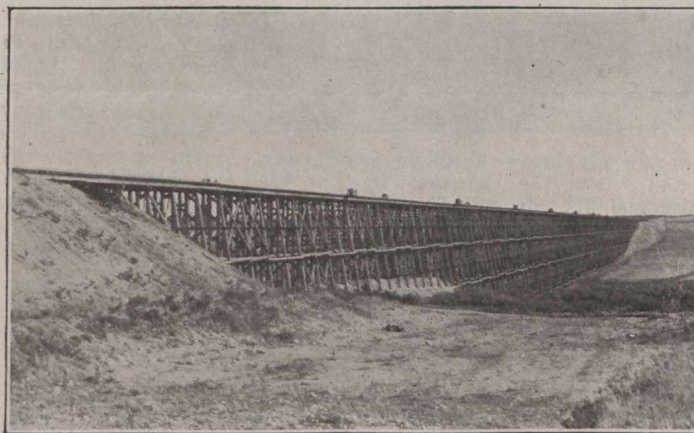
Typical Timber Trestle Bridge on G.T.P.R. at Rivers, Man.
